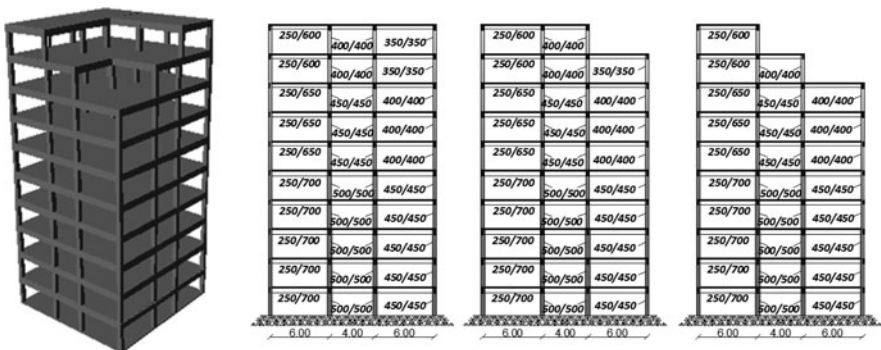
3D view (left) and geometry of typical frames of 10-storey building
